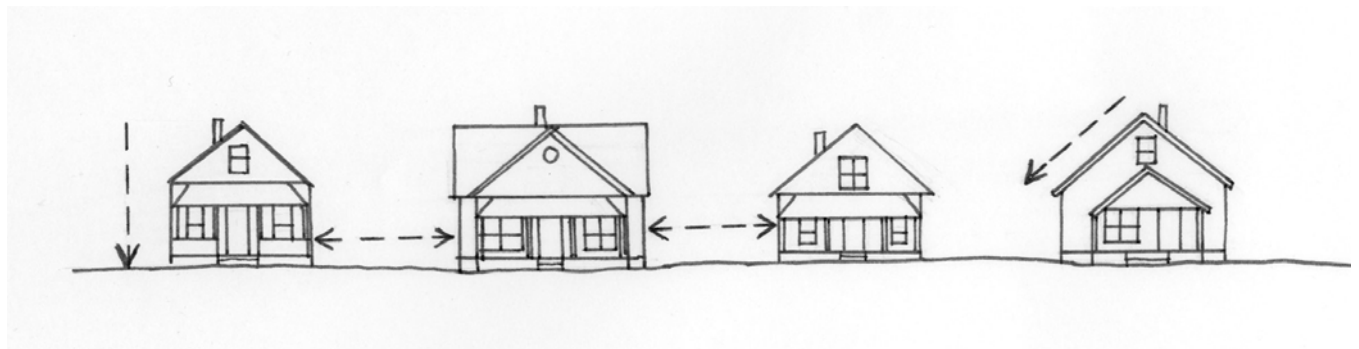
New construction should be consistent in roof forms, heights and spacing.
